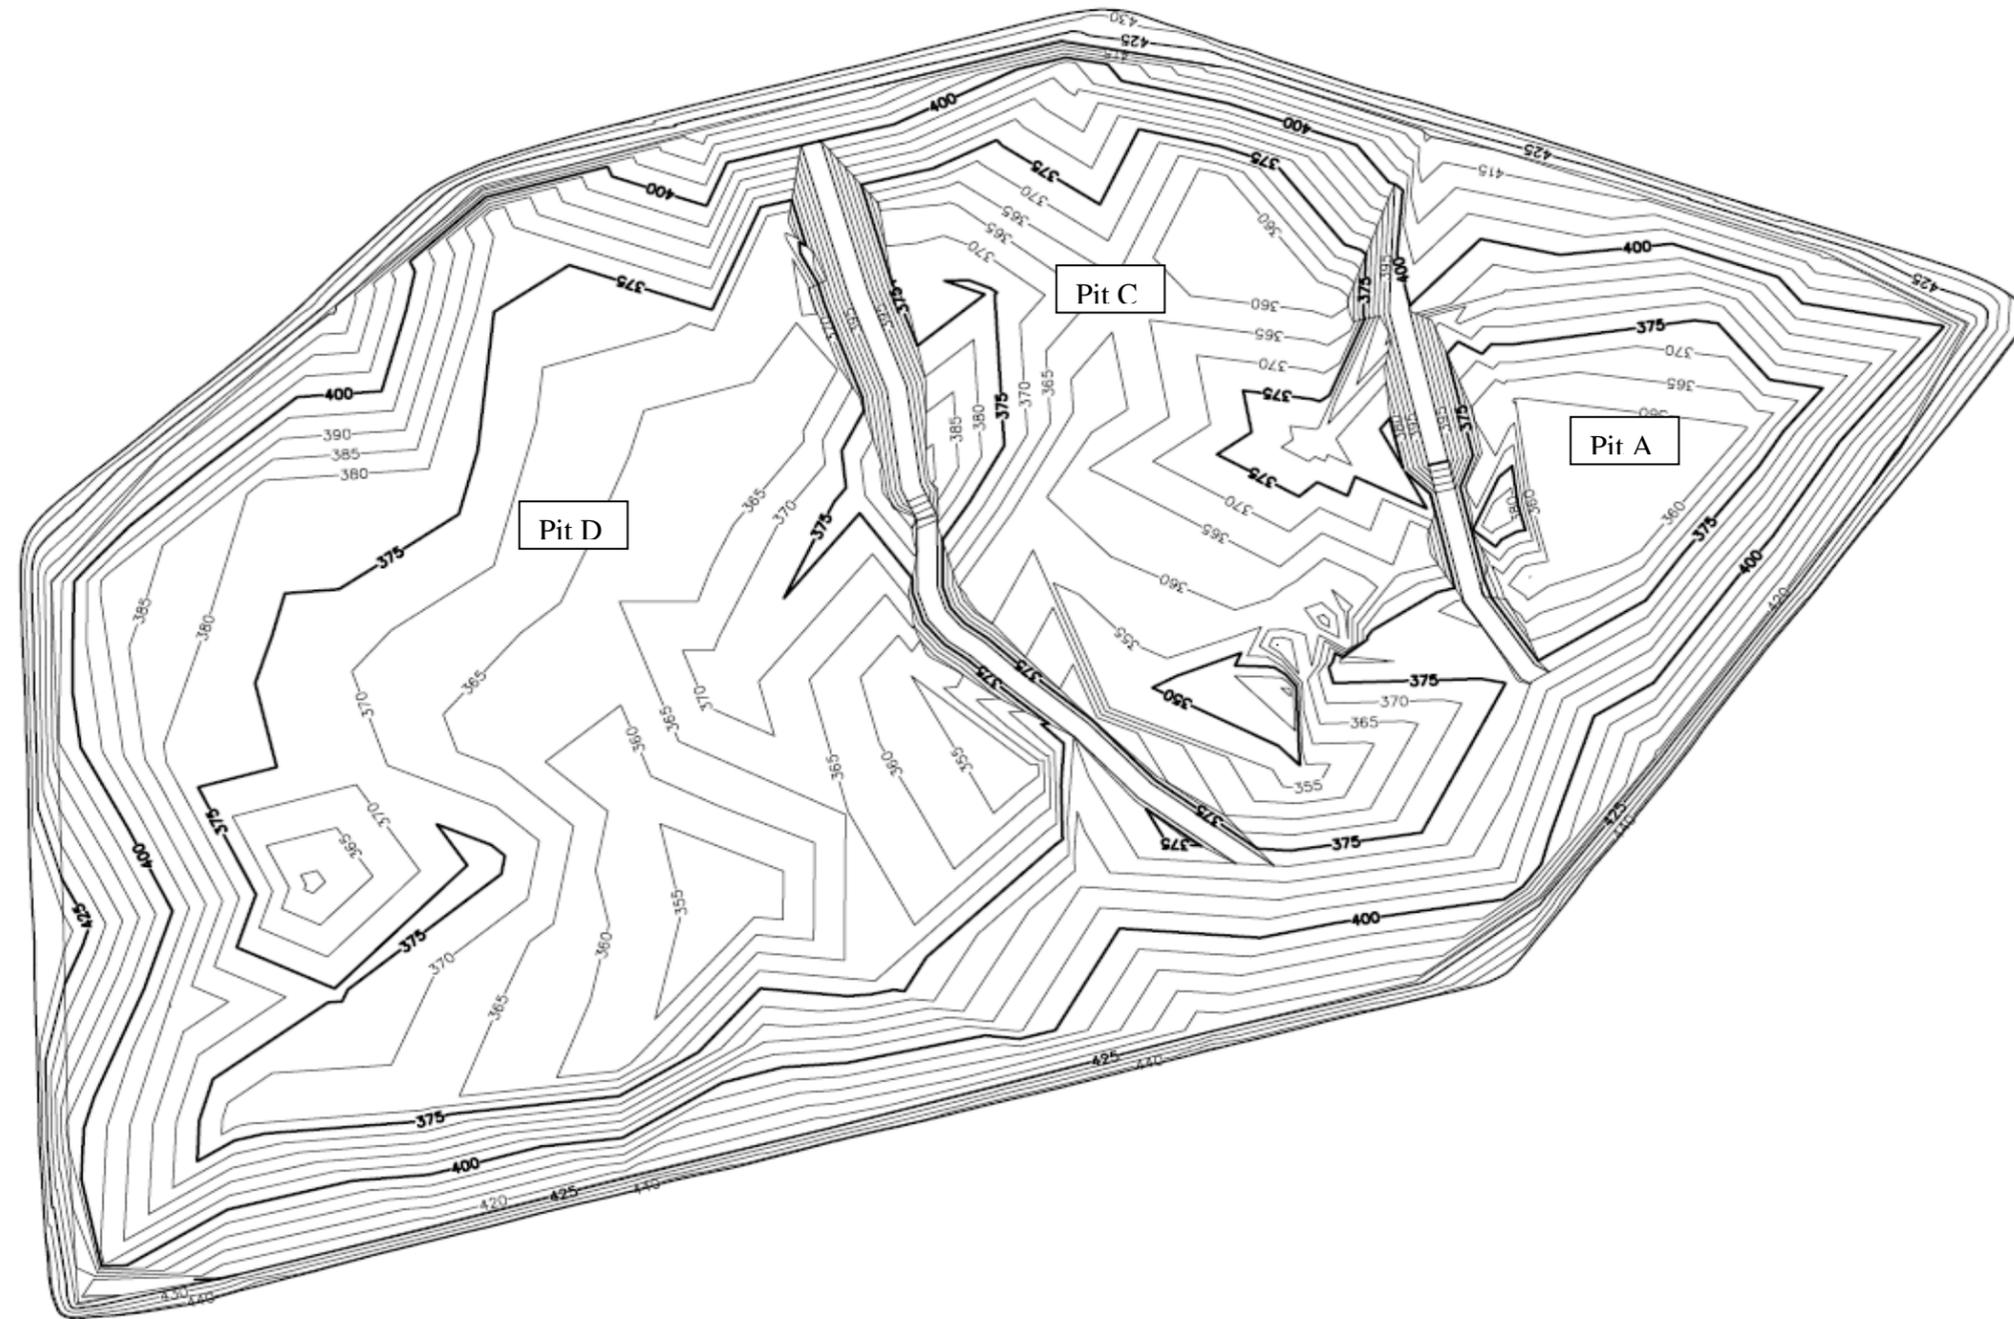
Bottom Elevation Contours of SOLW in WB-13
